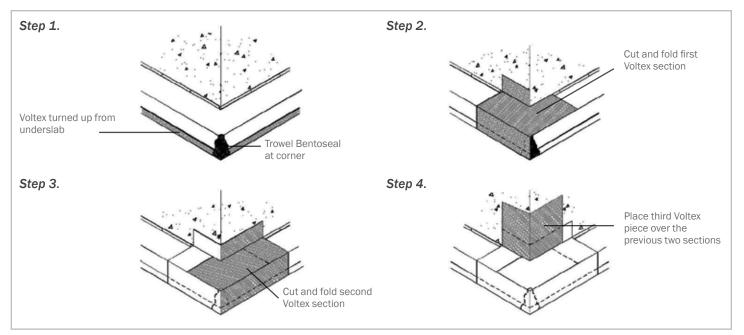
Step by step detail of outside wall base corner installation (hydrostatic condition).
